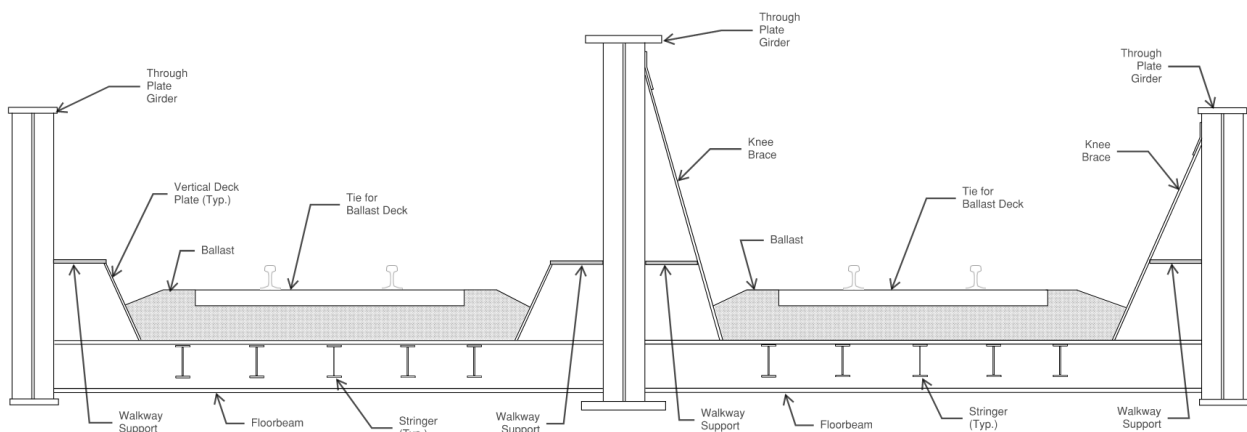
(d) – Double Track Through-girder Bridge with Shared Center Girder
